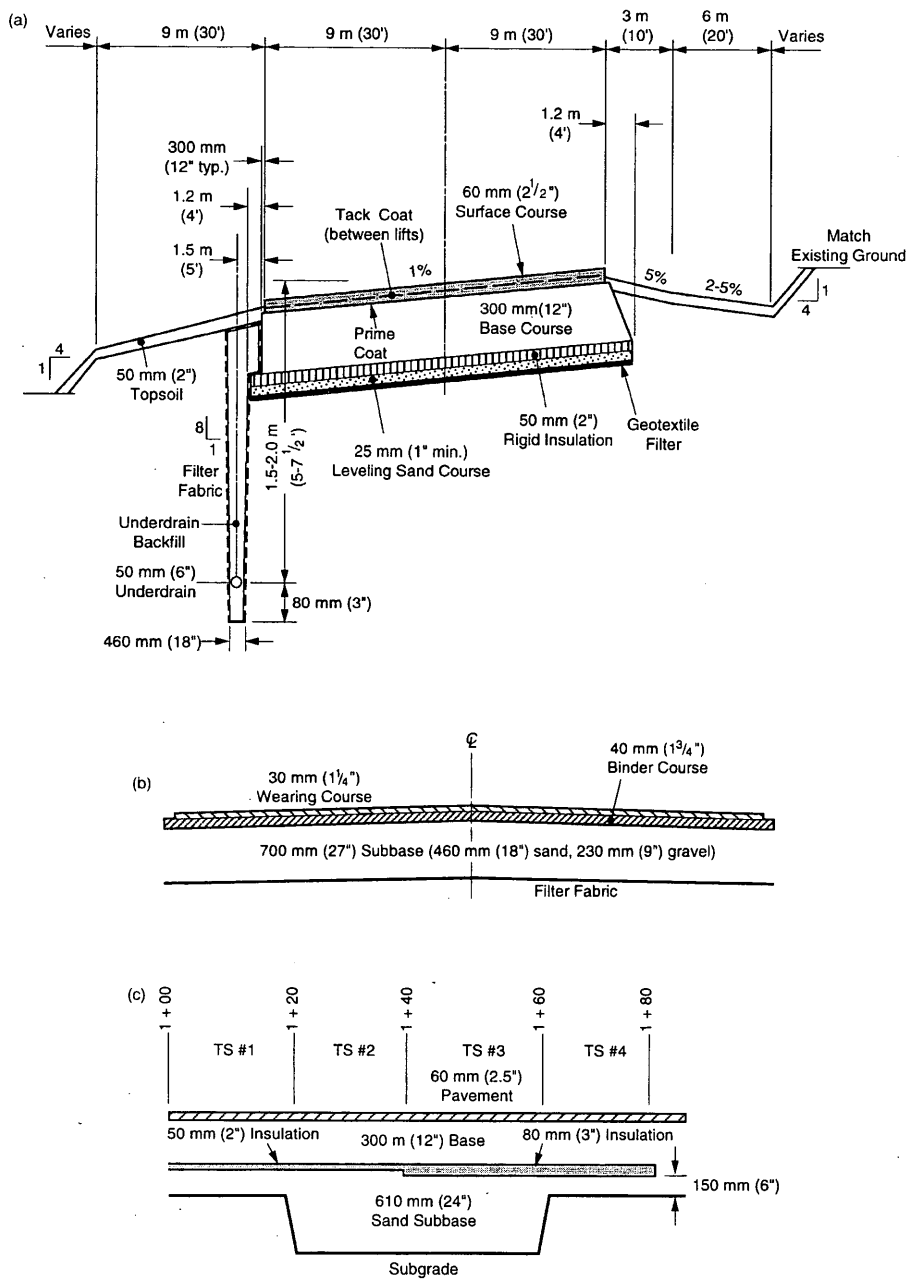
Typical cross section of (a) Newton Field runway and (b) Nichols Road and (c) longitudinal section of insulated test sections.
